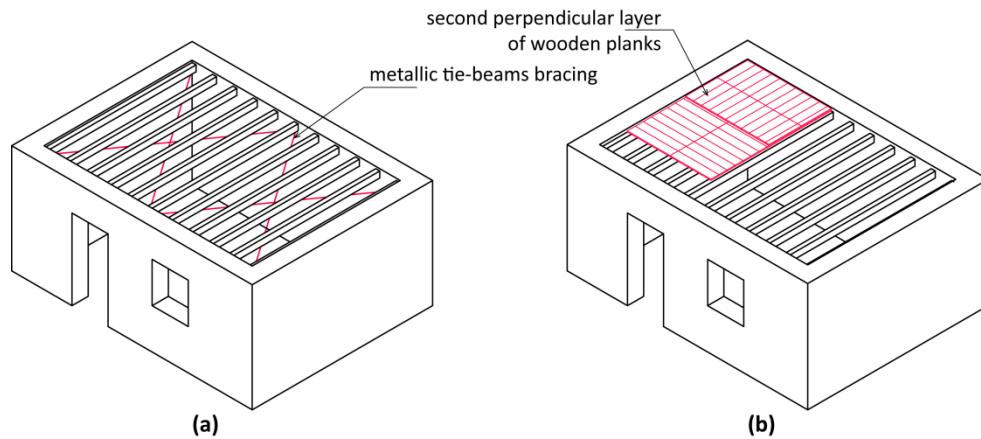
(a) Traditional way of stiffening floors and roofs by diagonal bracing; and (b) floor stiffening by adding an extra floor layer consisting of wooden planks placed perpendicular to the existing ones
